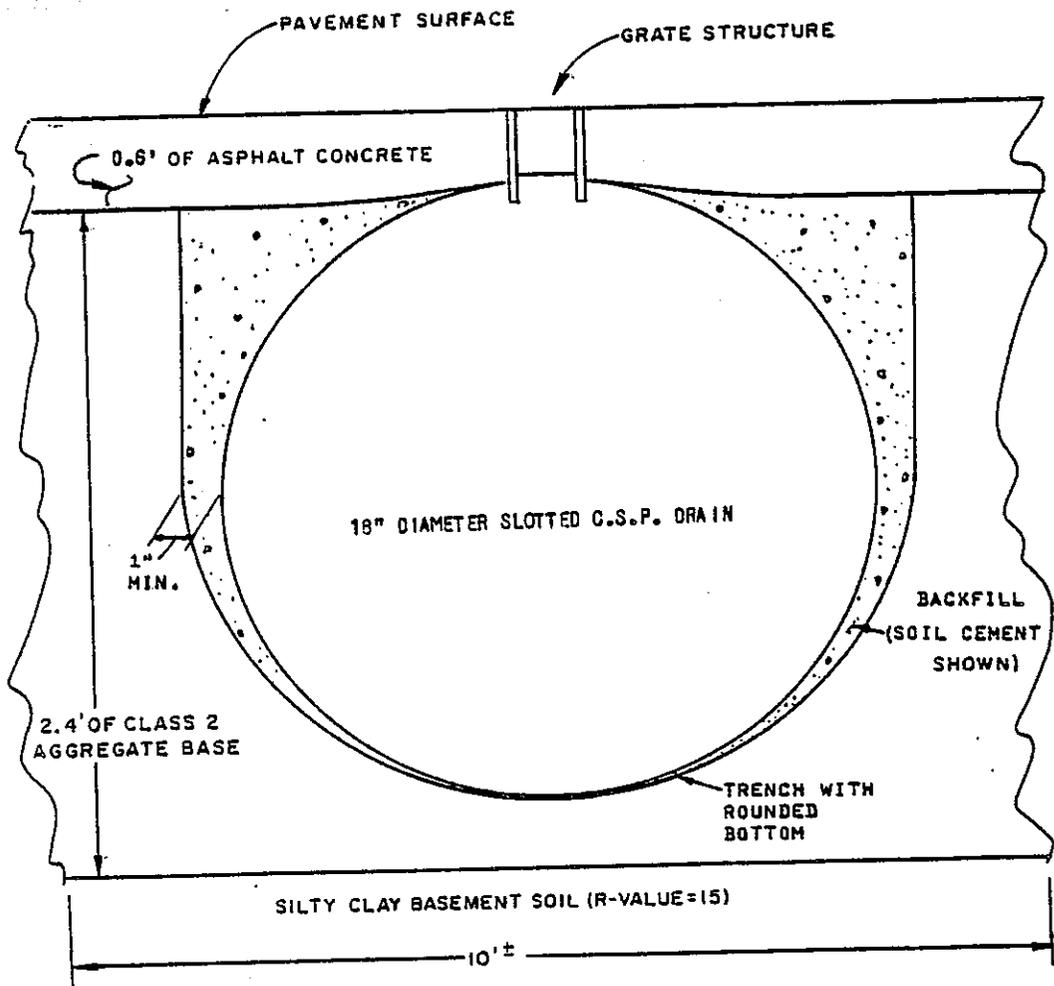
A CROSS SECTION OF THE SIMULATED ROADBED WITH A SLOTTED DRAIN INSTALLED.
